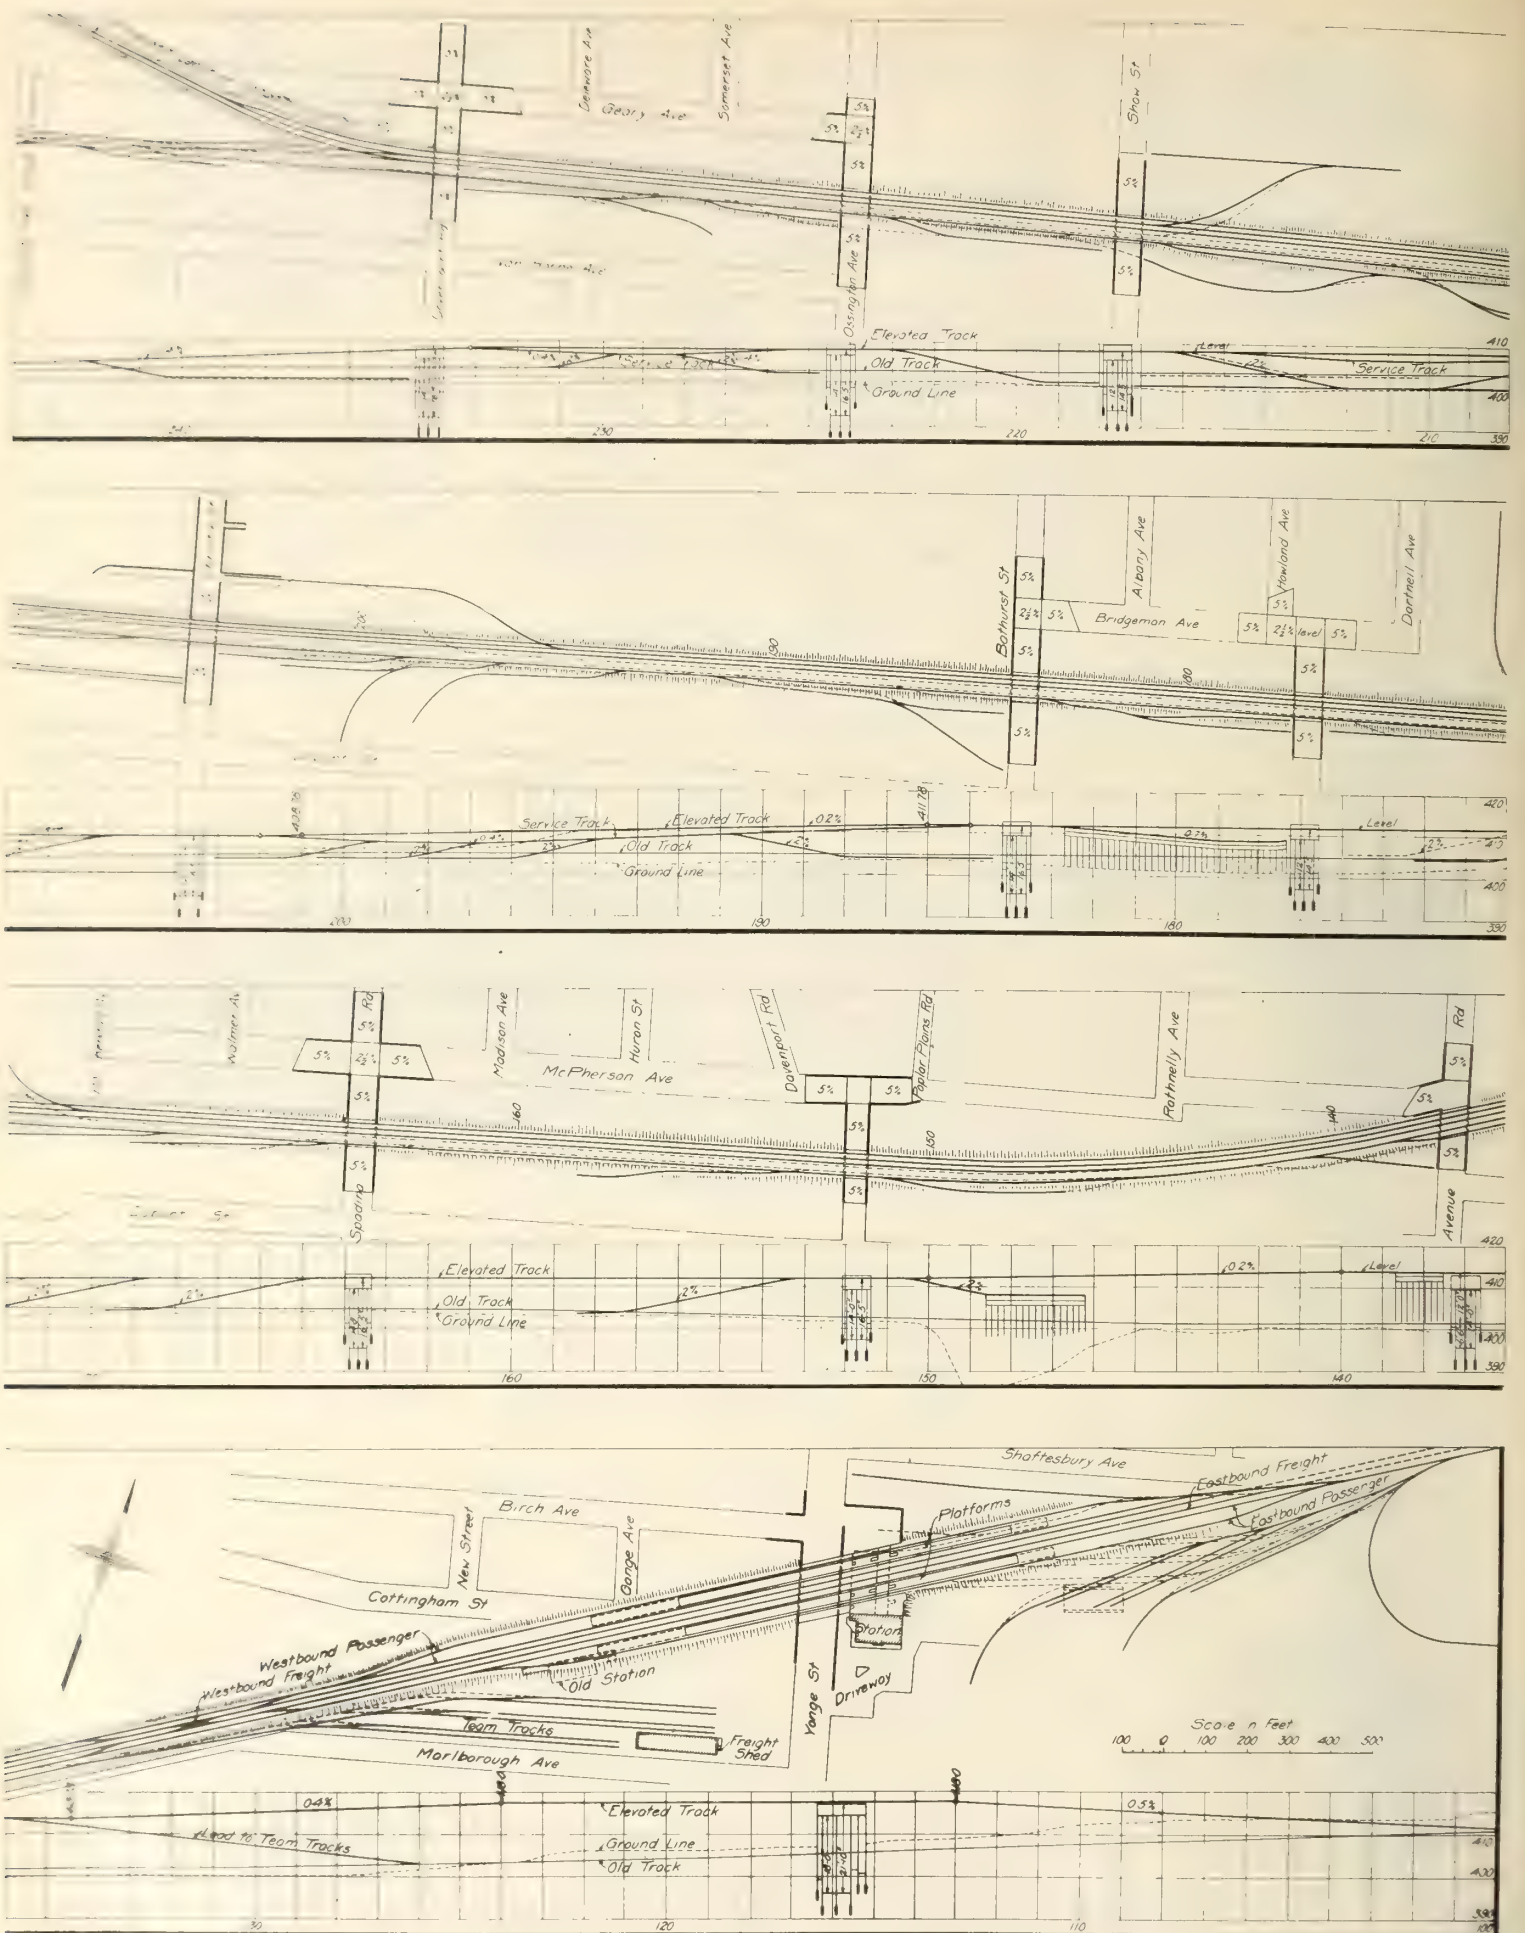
Plan and Profile of Track Elevation Across North Toronto.
